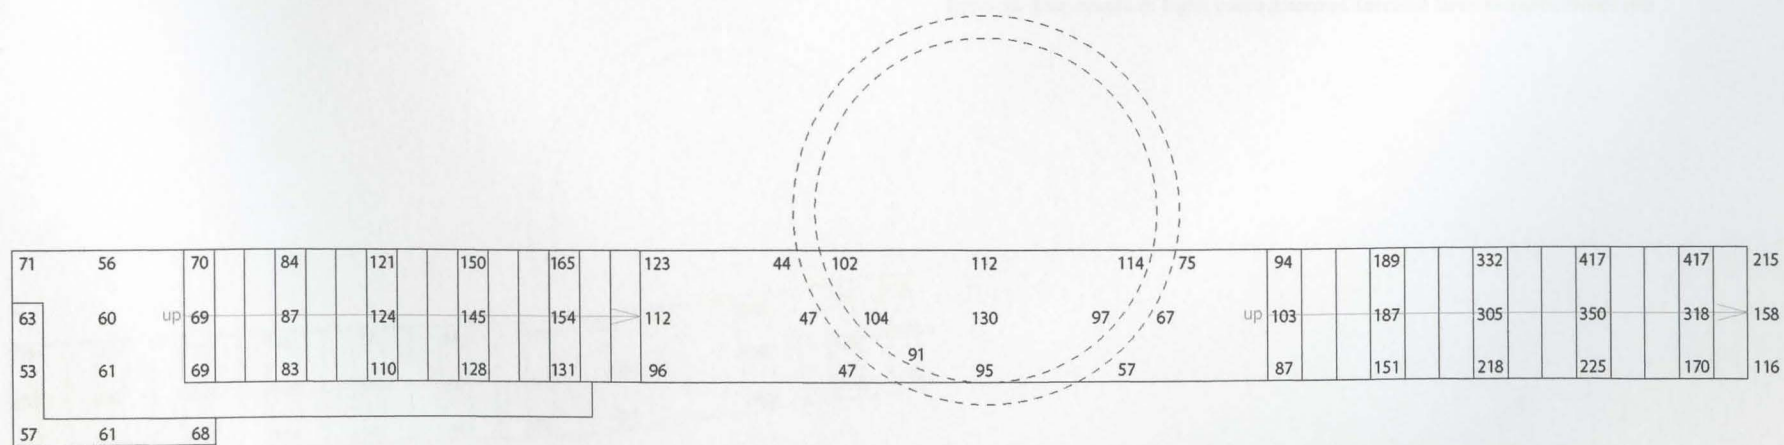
The result of light measurement (ground floor to first floor) [lx]
